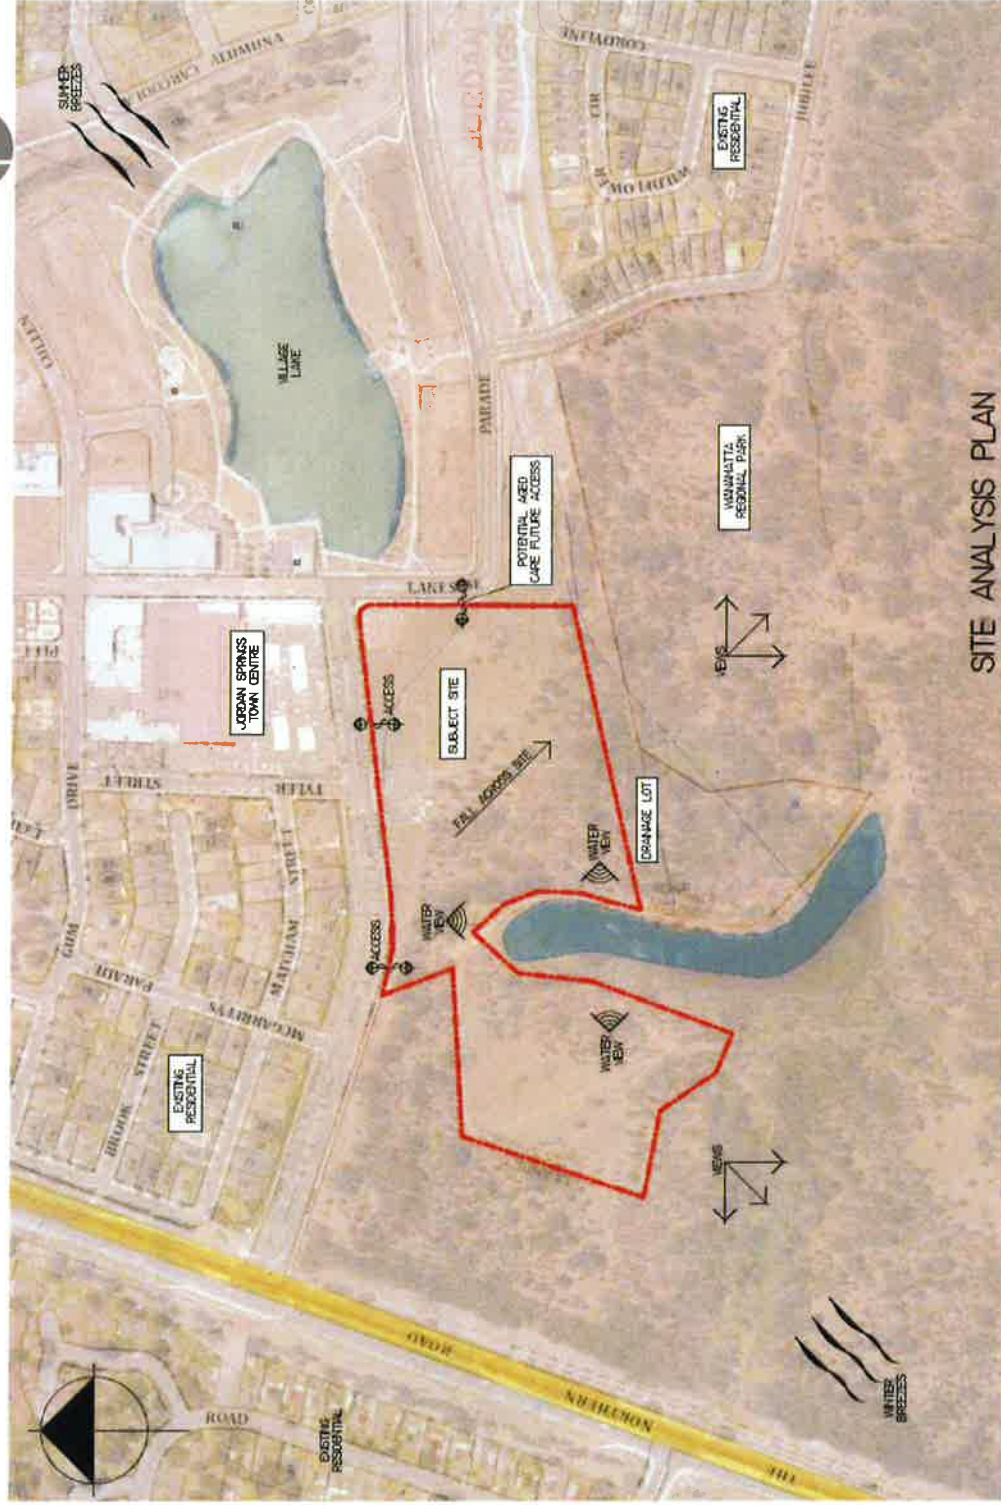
Site Analysis Plan (Source: A&N Design Group)
